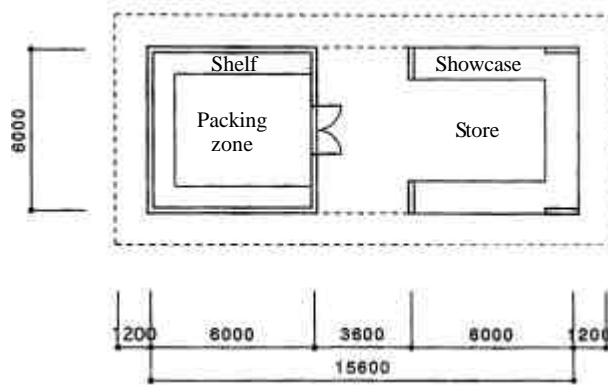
Floor Plan for Dry-salted Fish Storage and Retail Store
